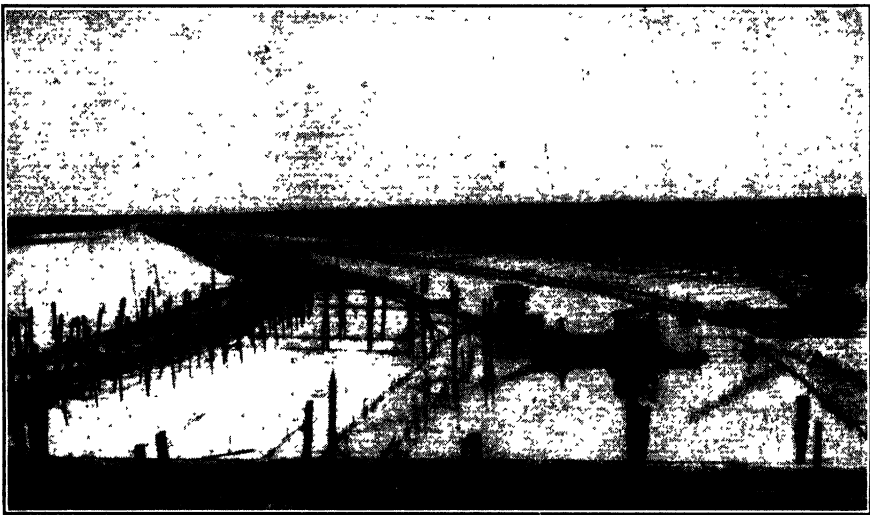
The Sardis Dam under construction by the U.S. Engineer Department. General layout of the hydraulic-fill pipelines. (Photograph by Tschebotarioff, Ref. 375, 1939.)
